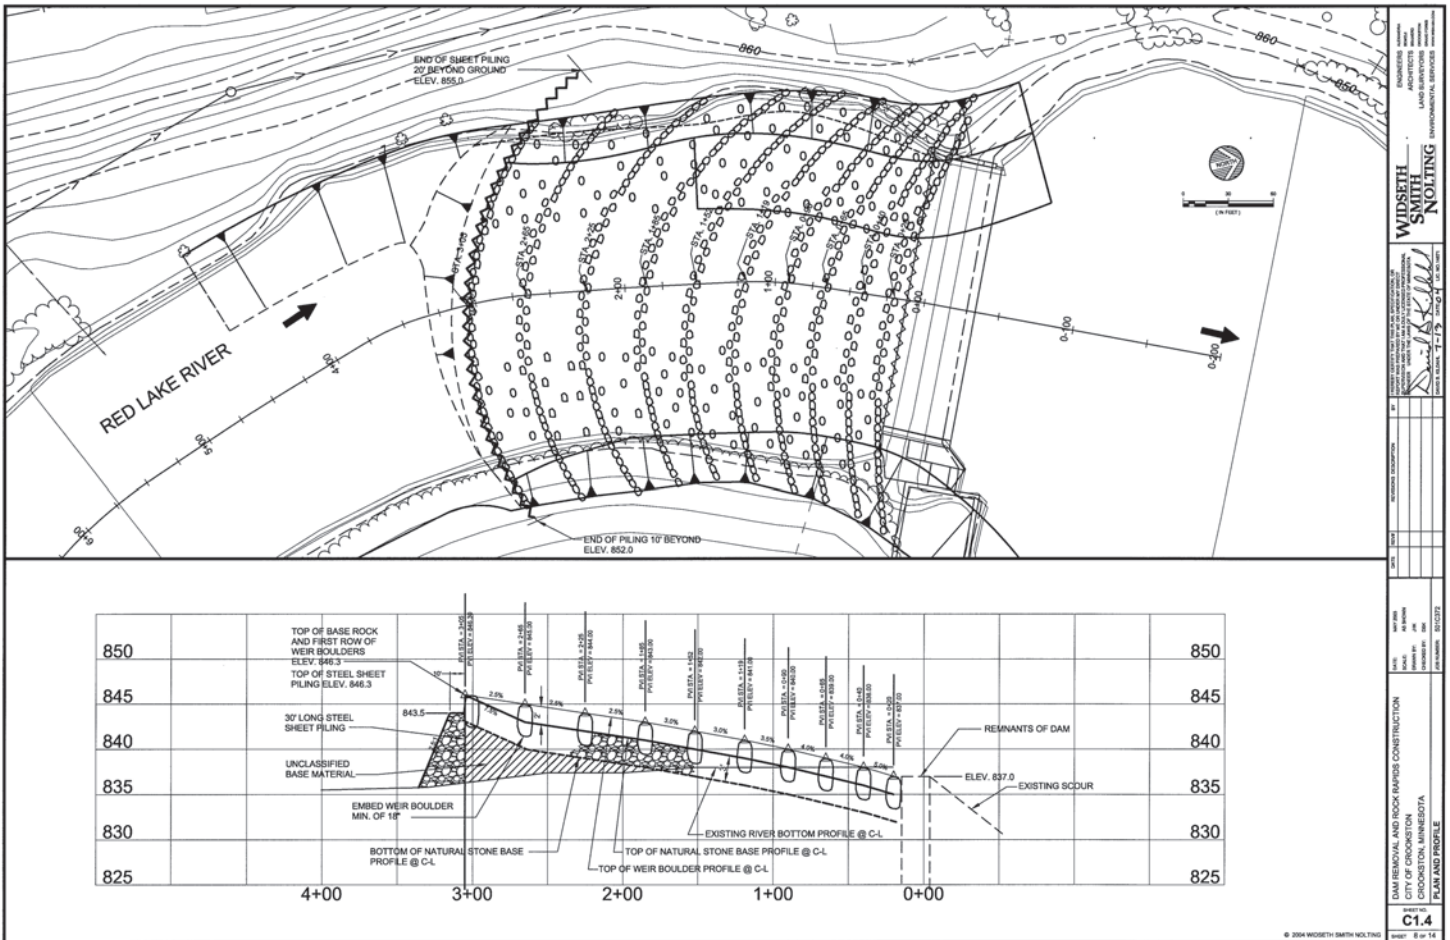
Planview and profile of the Crookston Rapids. David Kildahl, P.E. Widseth Smith Nolting, Project Engineer.
